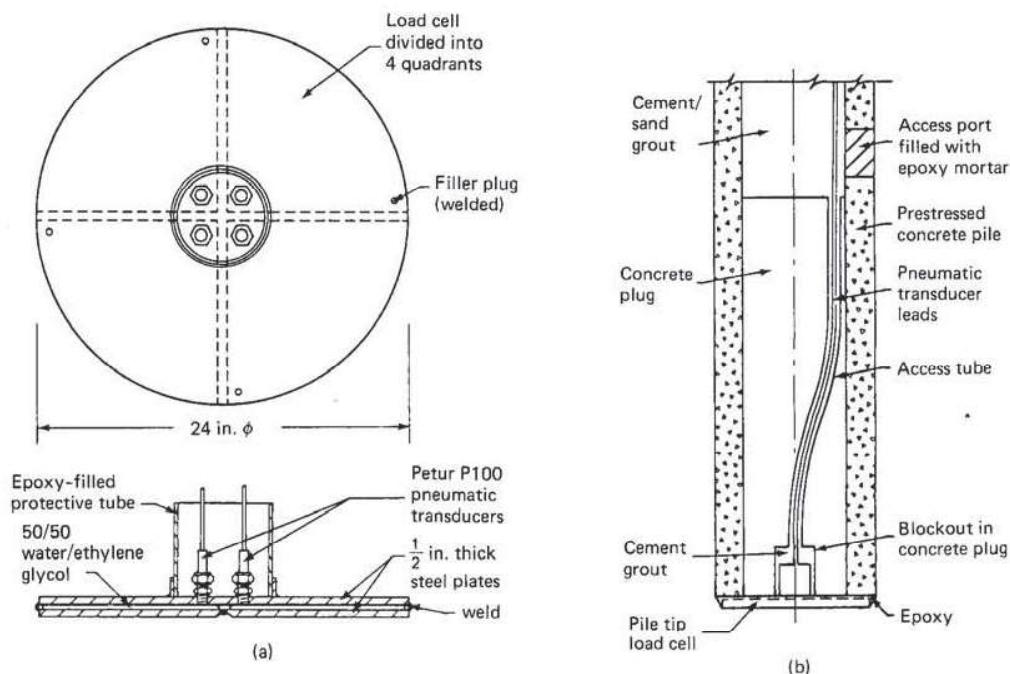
Contact earth pressure cell for measurement of pile tip load: (a) construction details of cell and (b) cell mounted on pile (after Green et al., 1983).
